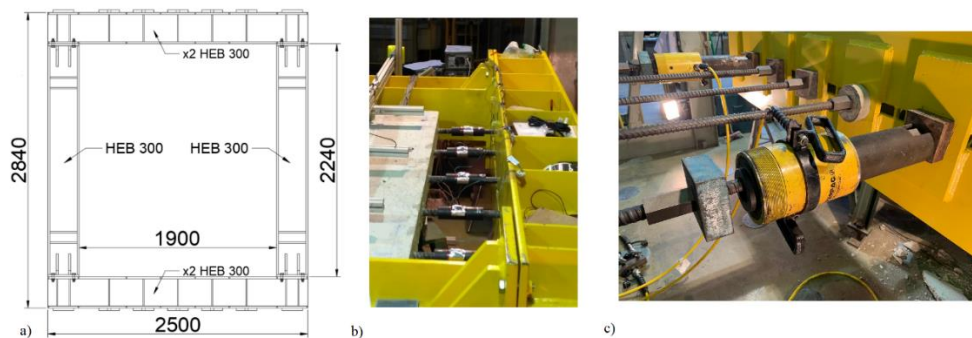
Tensioning system used to apply the axial force to the specimens: a) steel frame; b) Extension connected to the protruding bars; c) Jacks placed at the active anchorage.
